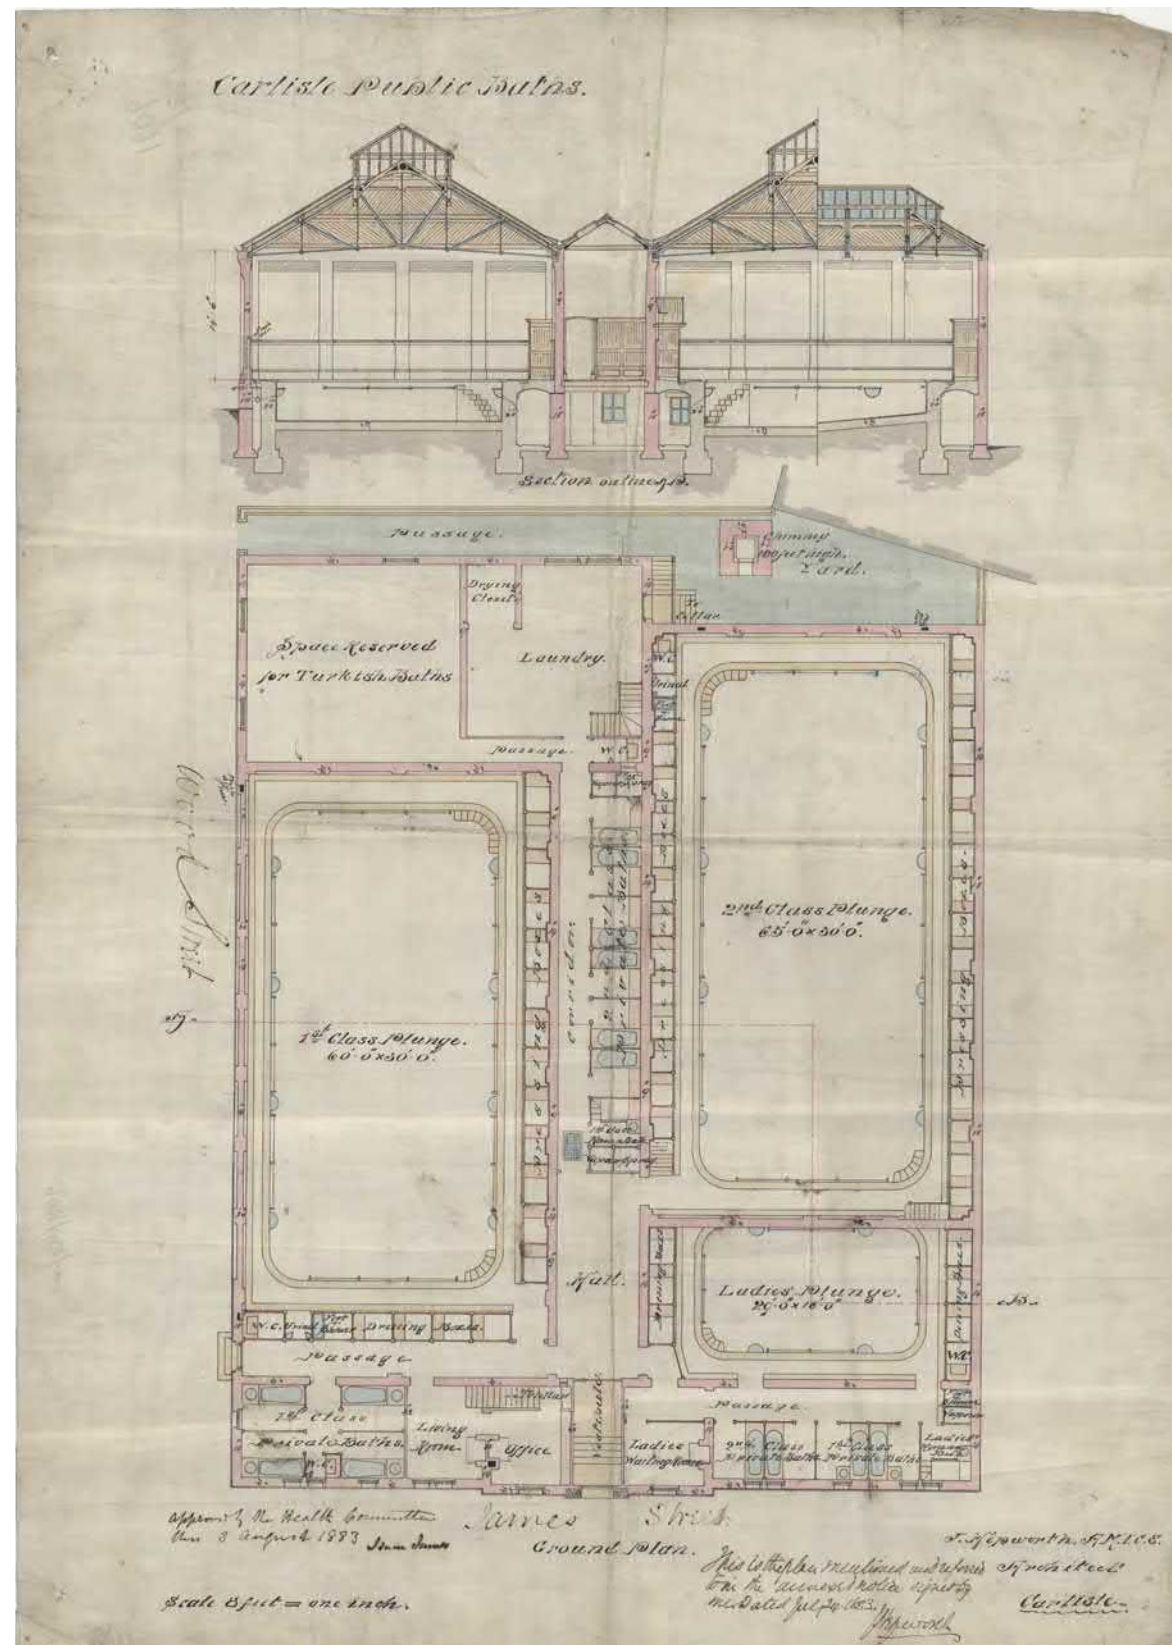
James Street Baths, architects plan (Pre-Turkish Health Suite addition), 1883.
